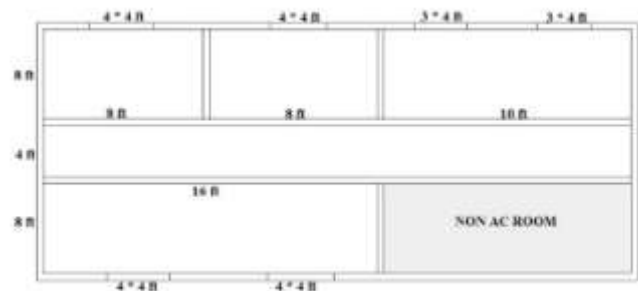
LAYOUT OF THE OFFICE IN COMMERCIAL BUILDING
